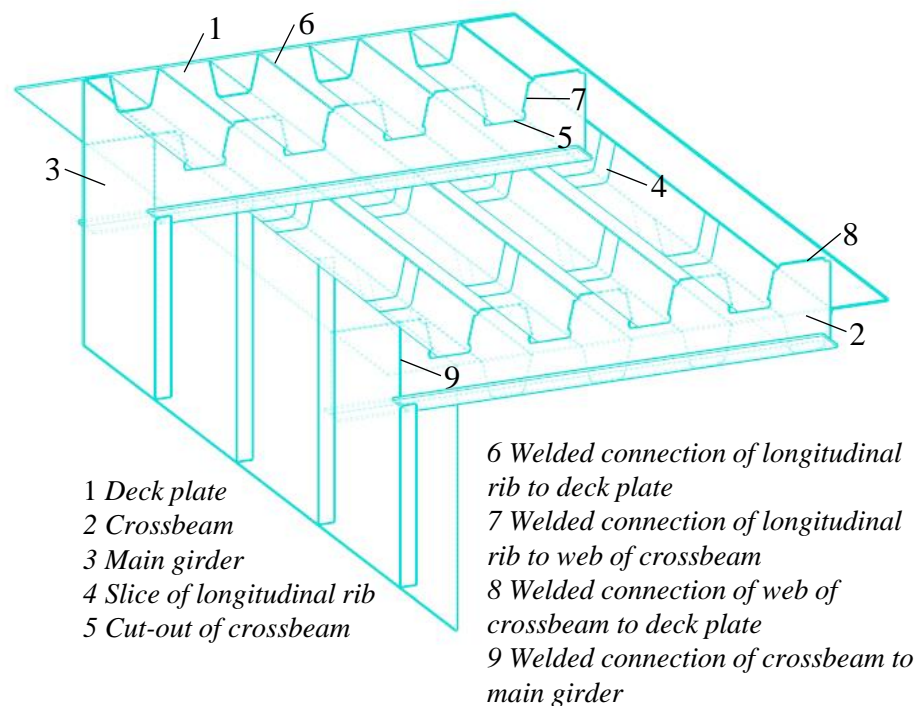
Perspective drawing of a typical orthotropic steel deck structure
